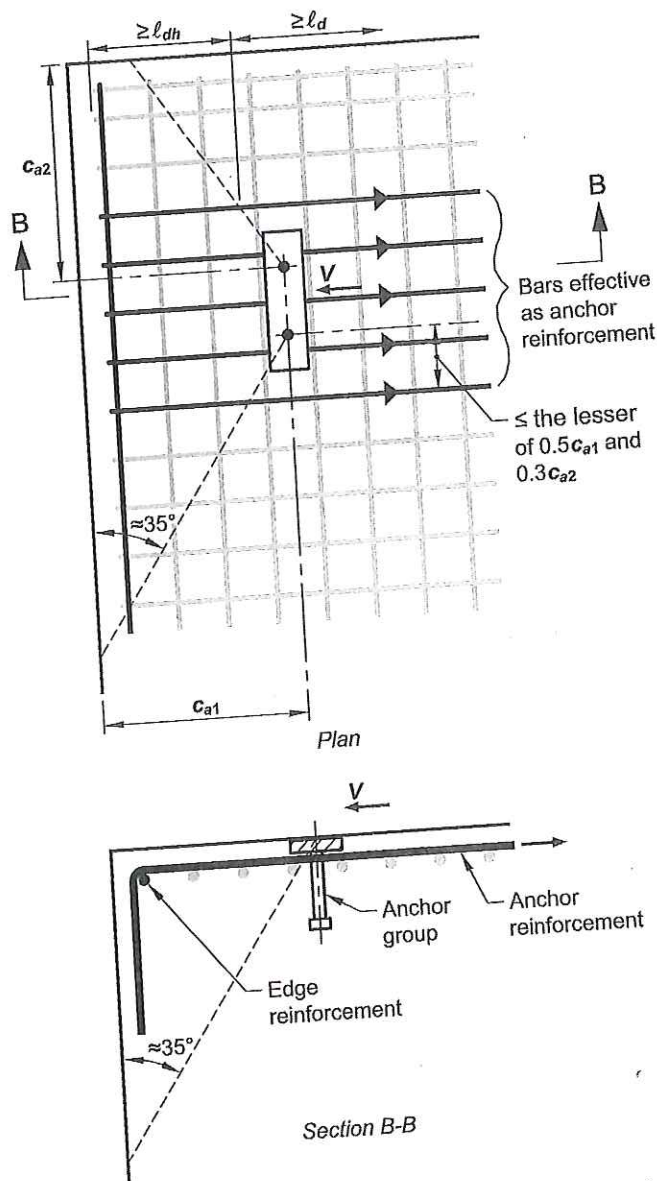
Edge reinforcement and anchor reinforcement for shear.
